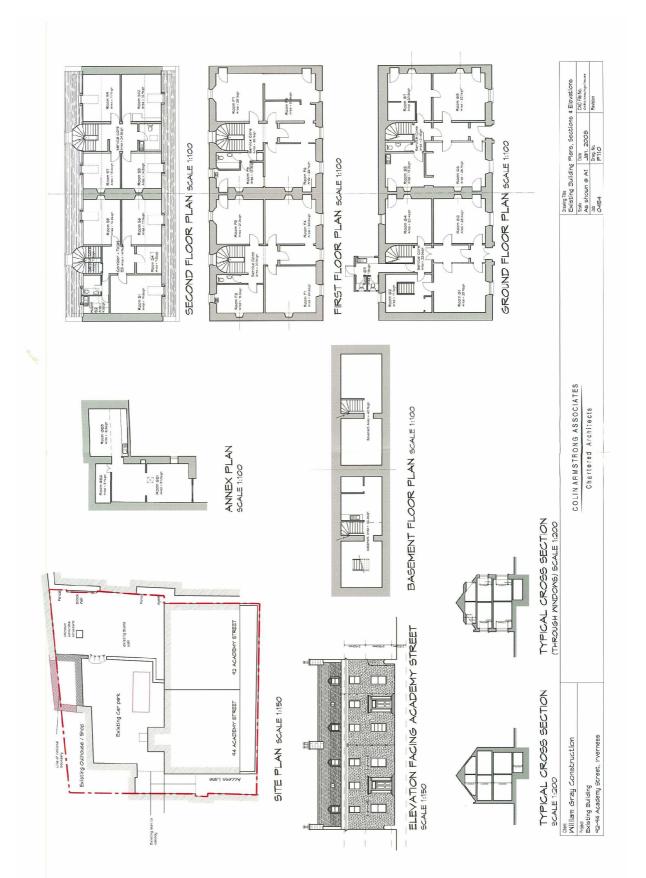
Plans (Altered upon Survey) © Colin Armstrong Architects. (Room Numbers in Red relate to Text)
